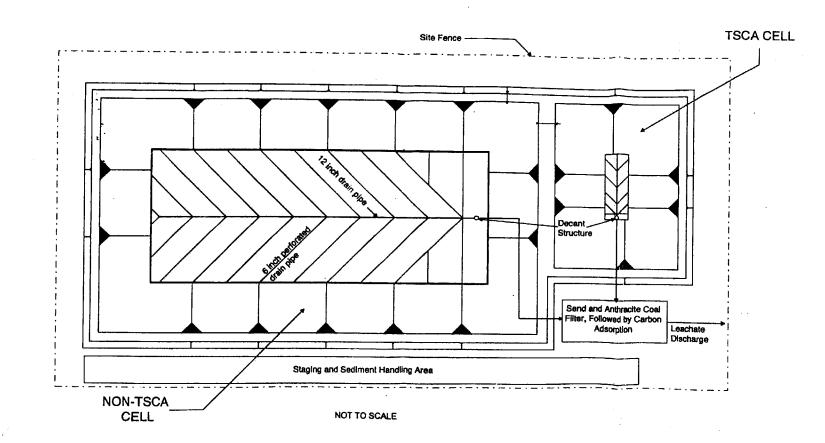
Conceptual Plan View Layout of TSCA and Non-TSCA Landfill Disposal Facility for Ashtabula River Dredged Sediments.
